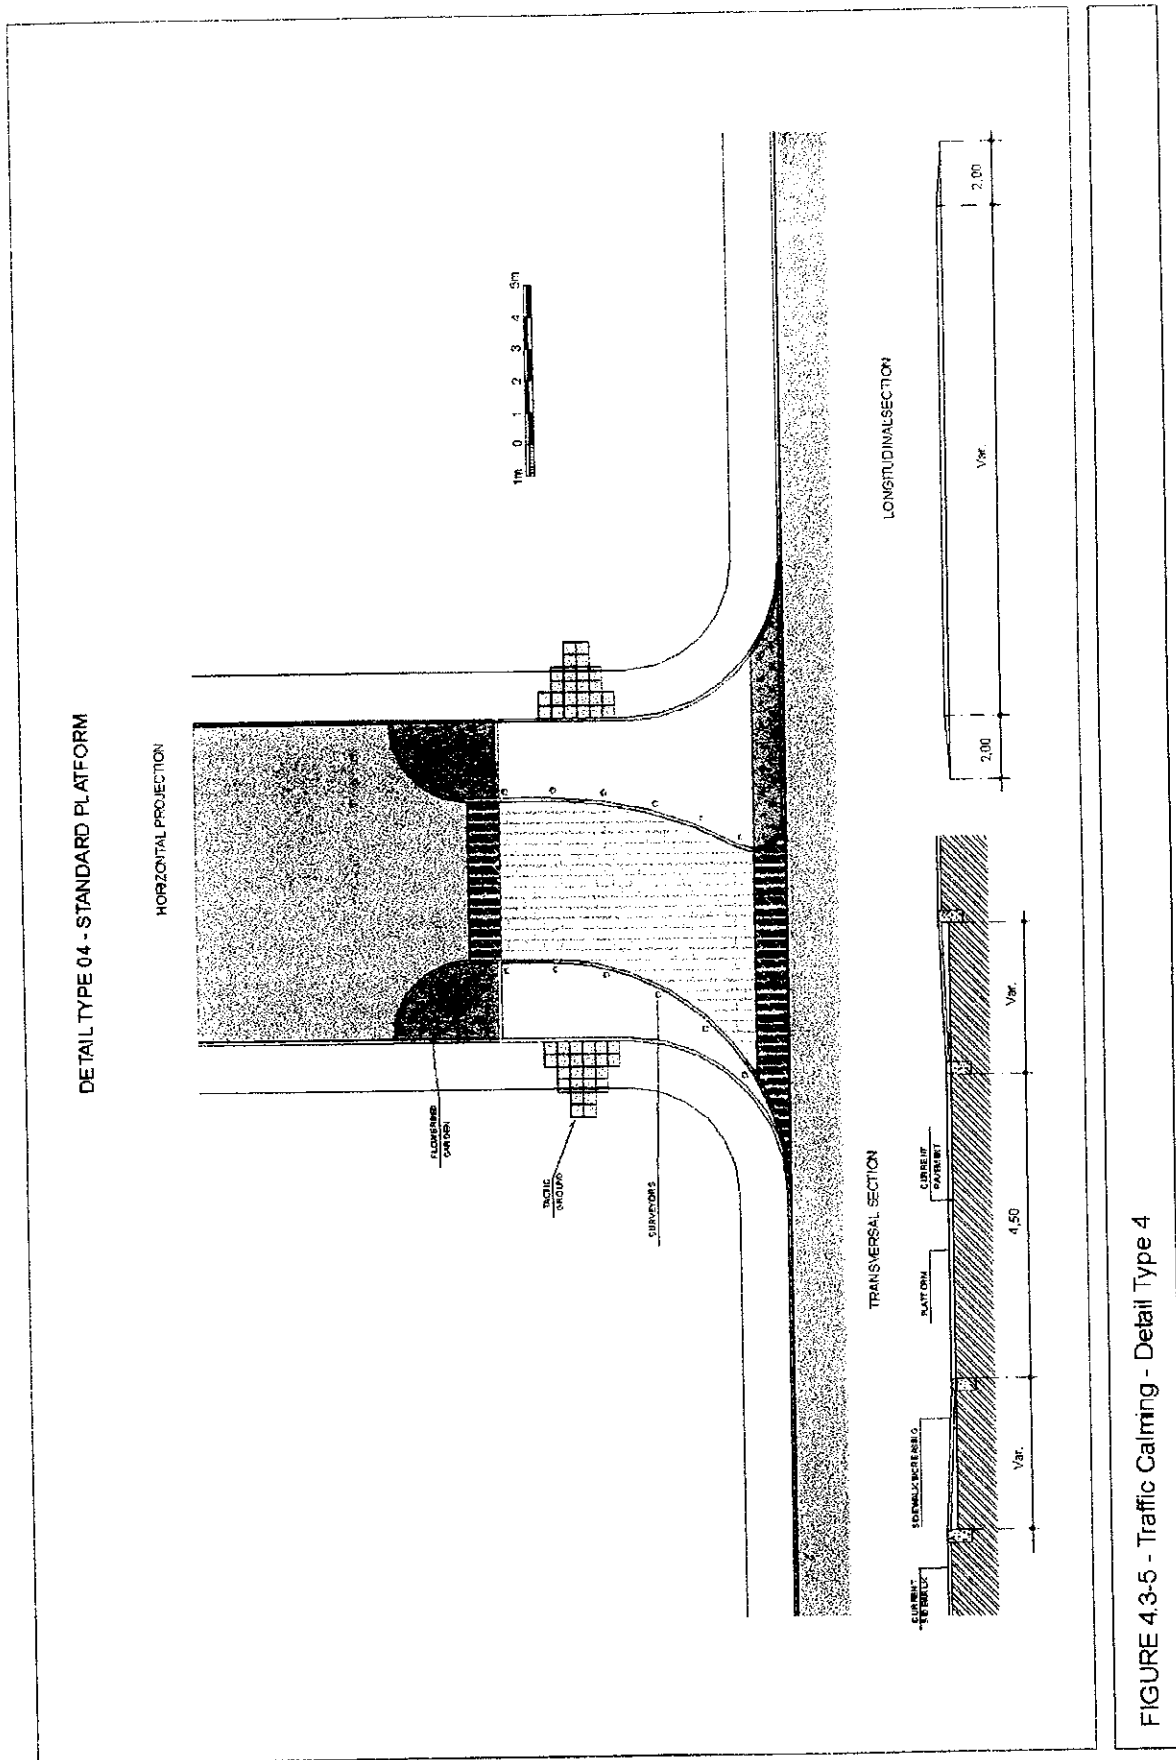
Traffic Calming - Detail Type 4
